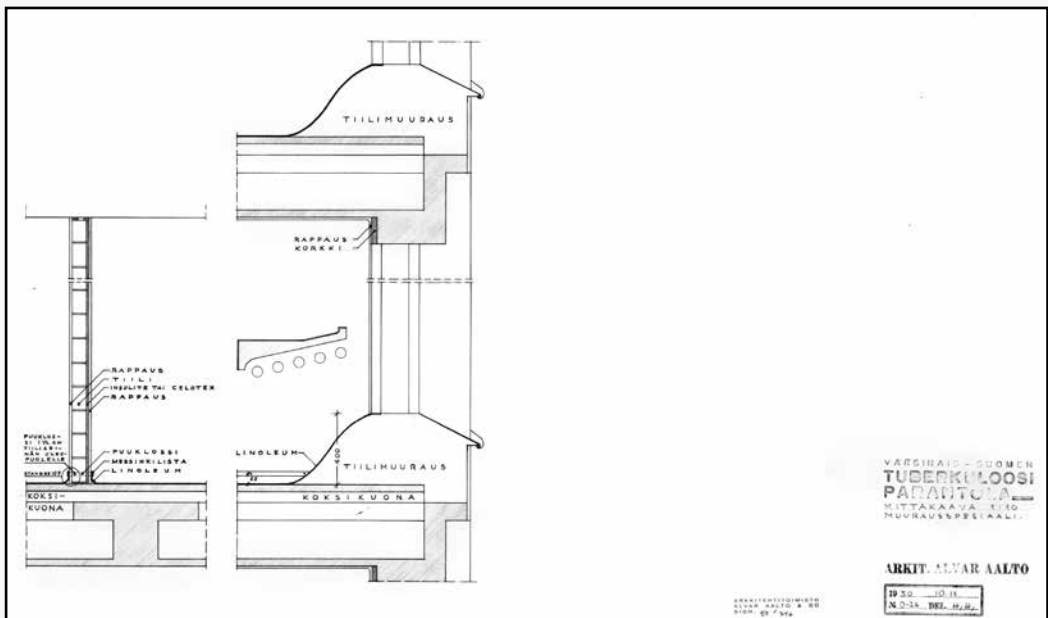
The drawing shows the connection of the ceiling and the floor to the walls. Aalto used covered corners for easier cleaning. Drawing No. 50-346. The drawing has been edited. AAM.
